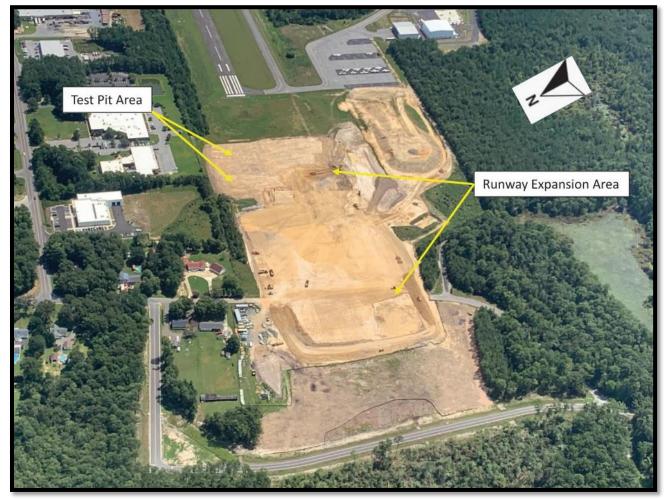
Runway Expansion Area at 2W6 and Test Pit Area
